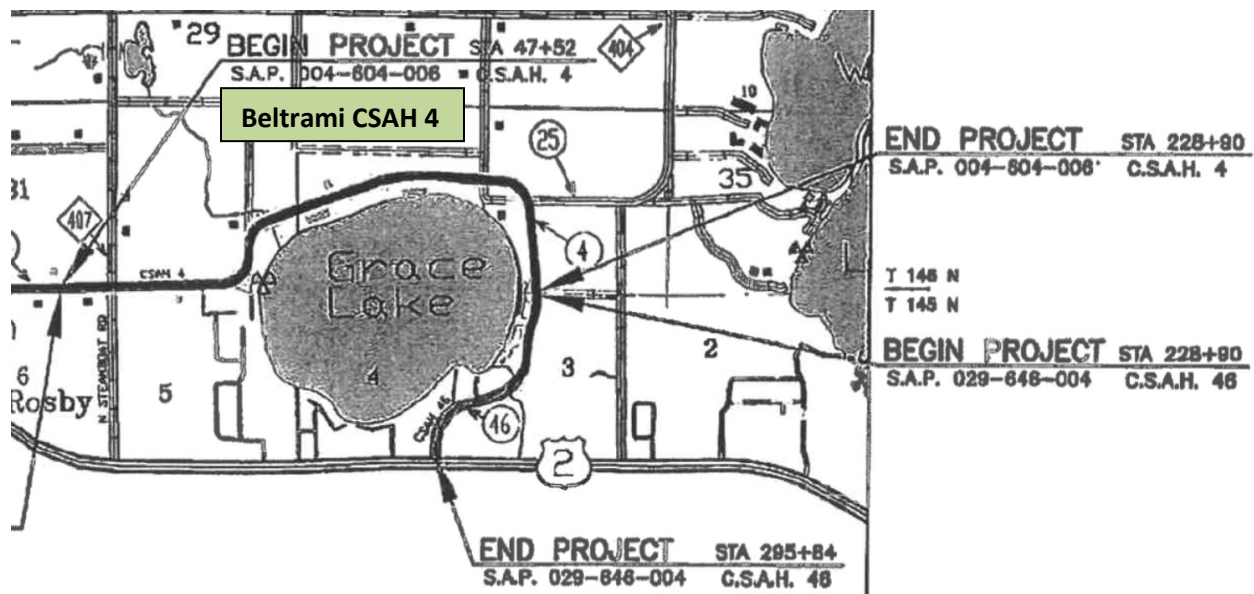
Beltrami CSAH 4 and Hubbard CSAH 46 from 2020 Construction Plan
